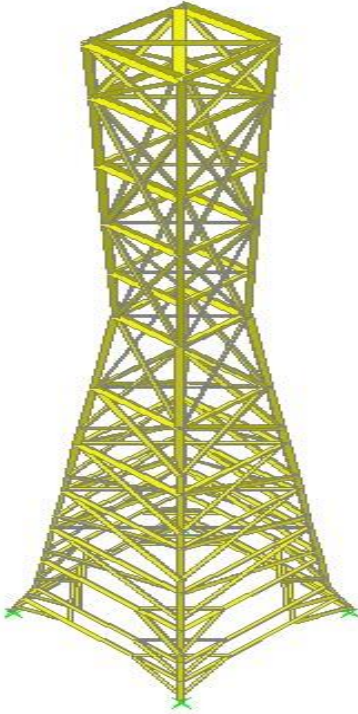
The plans of render view of the tower. Fig 2.2 Elevation of tower.
